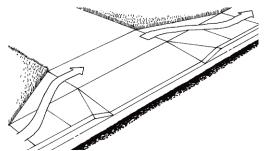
Increasing Accessibility On Narrow Sidewalk (Axelson, et al., 2001, p.5-4)
